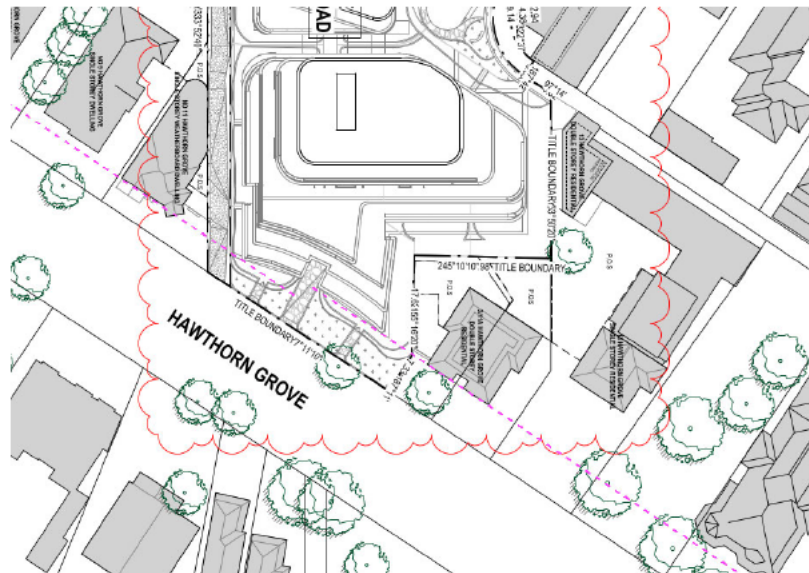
Proposal's street wall setbacks from Hawthorn Grove, which are in line with adjoining properties and generally consistent with prevailing setback of heritage dwelling
